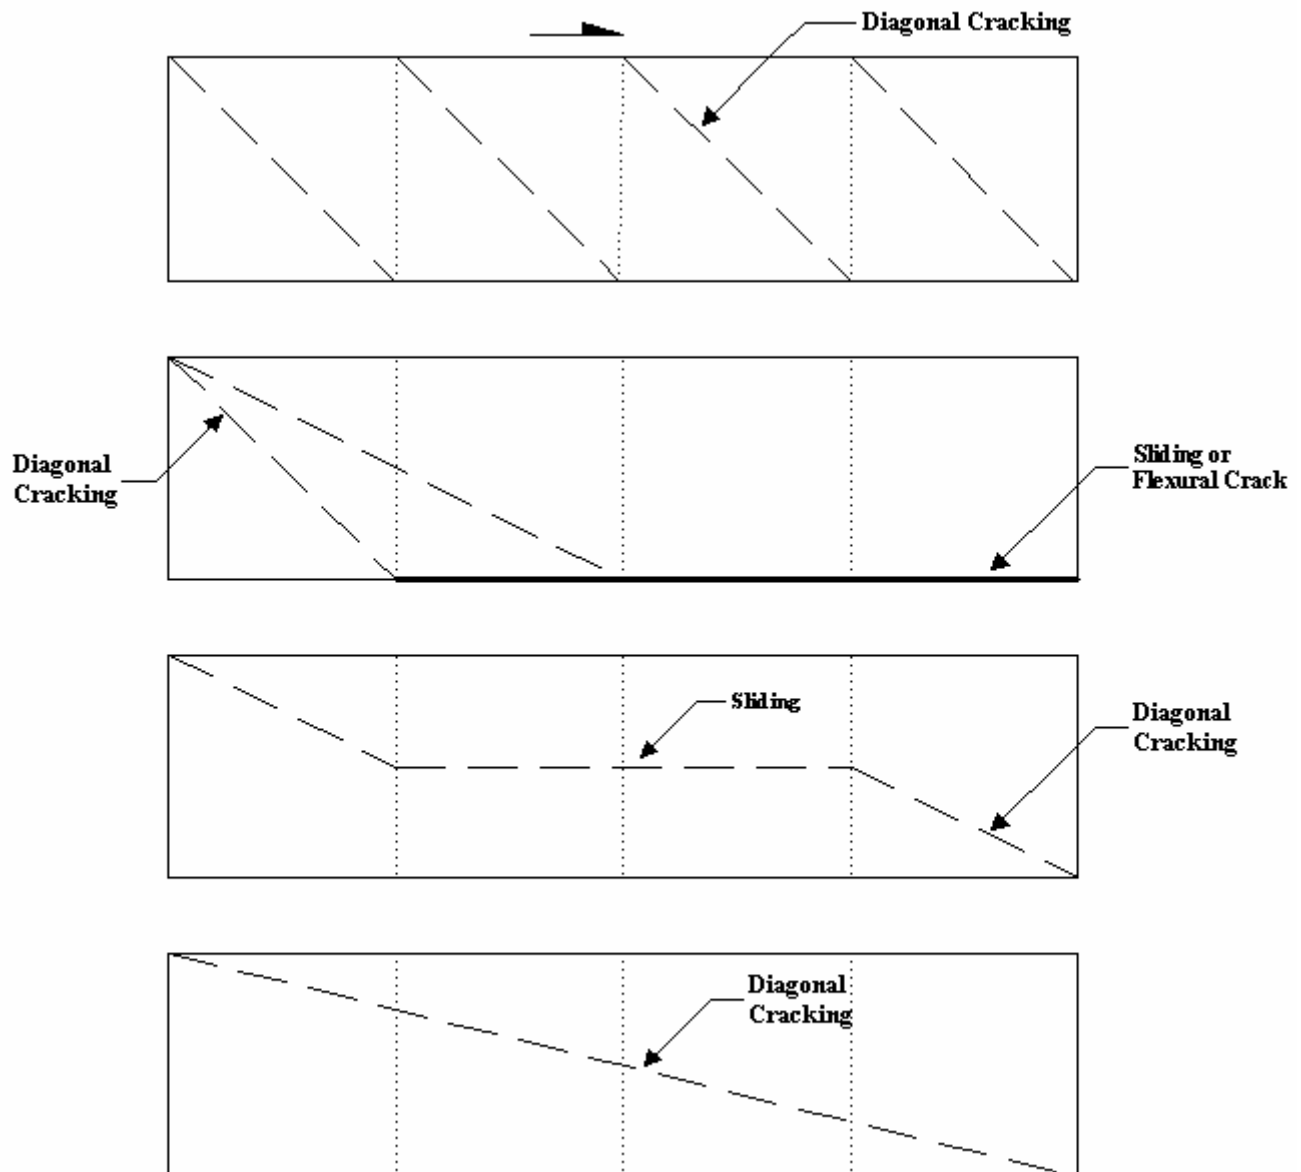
Possible crack patterns for wide-spaced partially grouted masonry.
